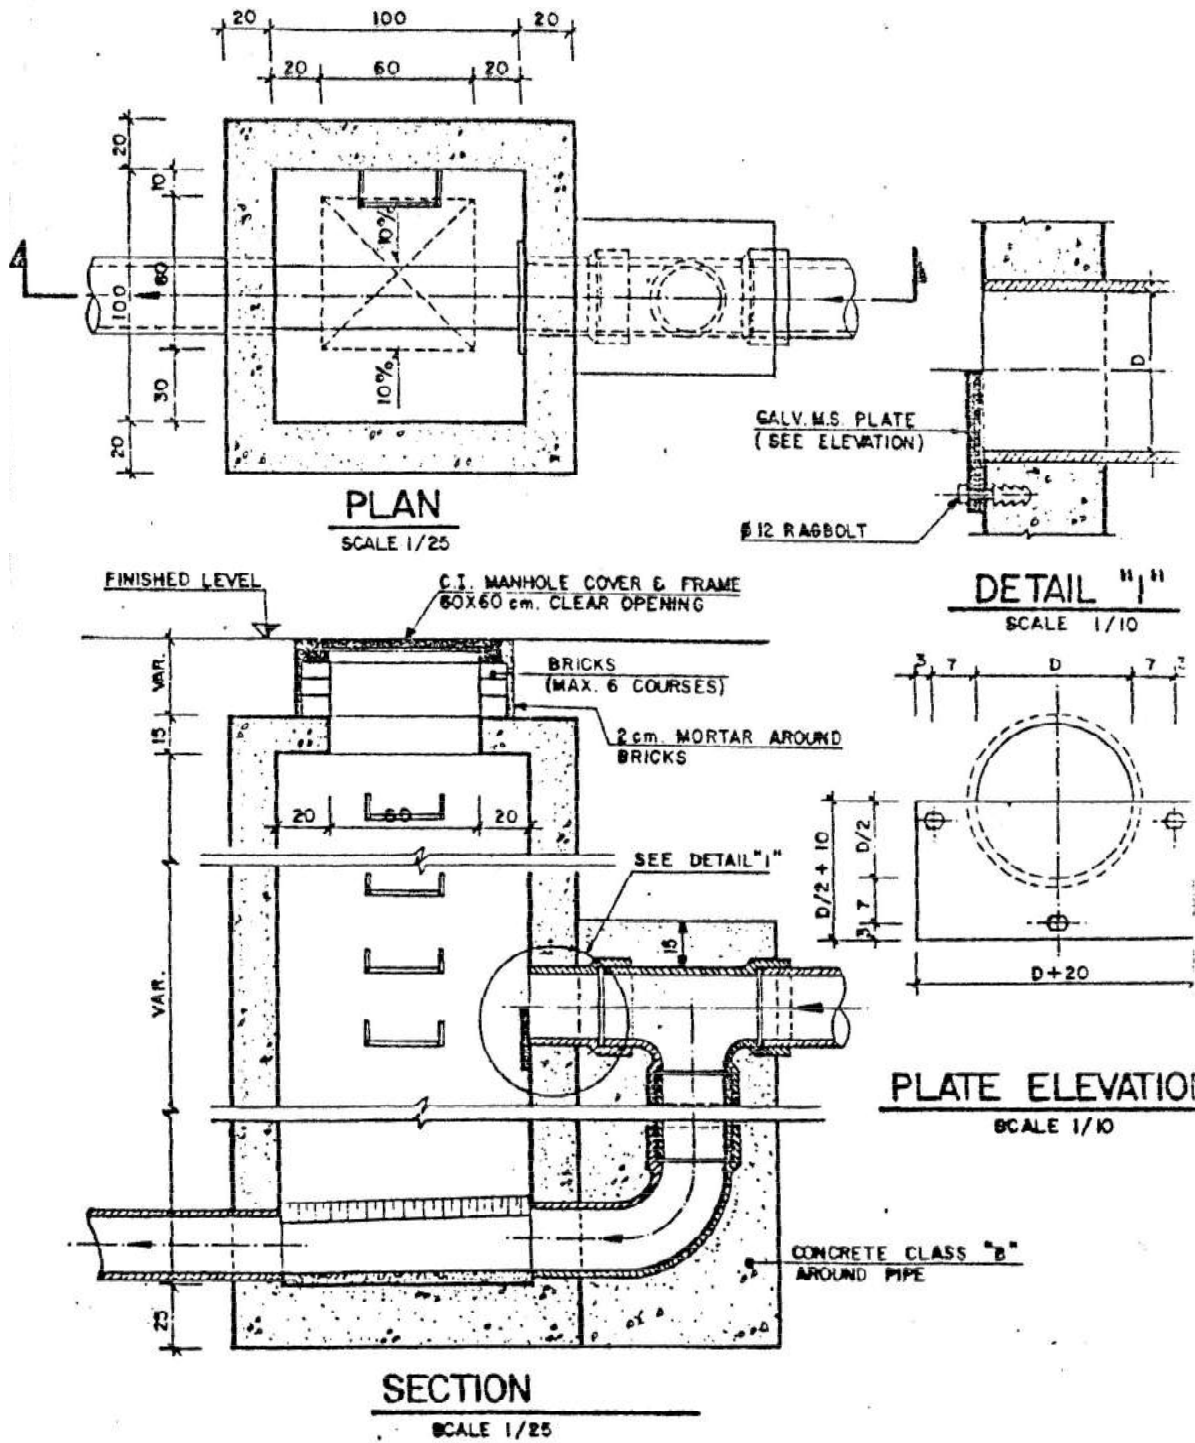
/5: TYPICAL DROP MANHOLE FOR
